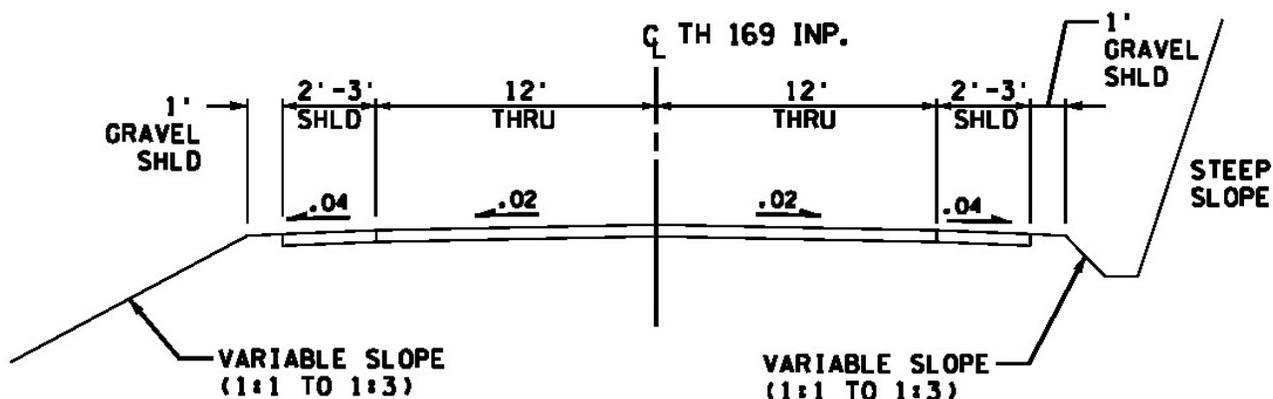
Existing Highway 1/169 Cross Section – Eagles Nest Lake Project Area
